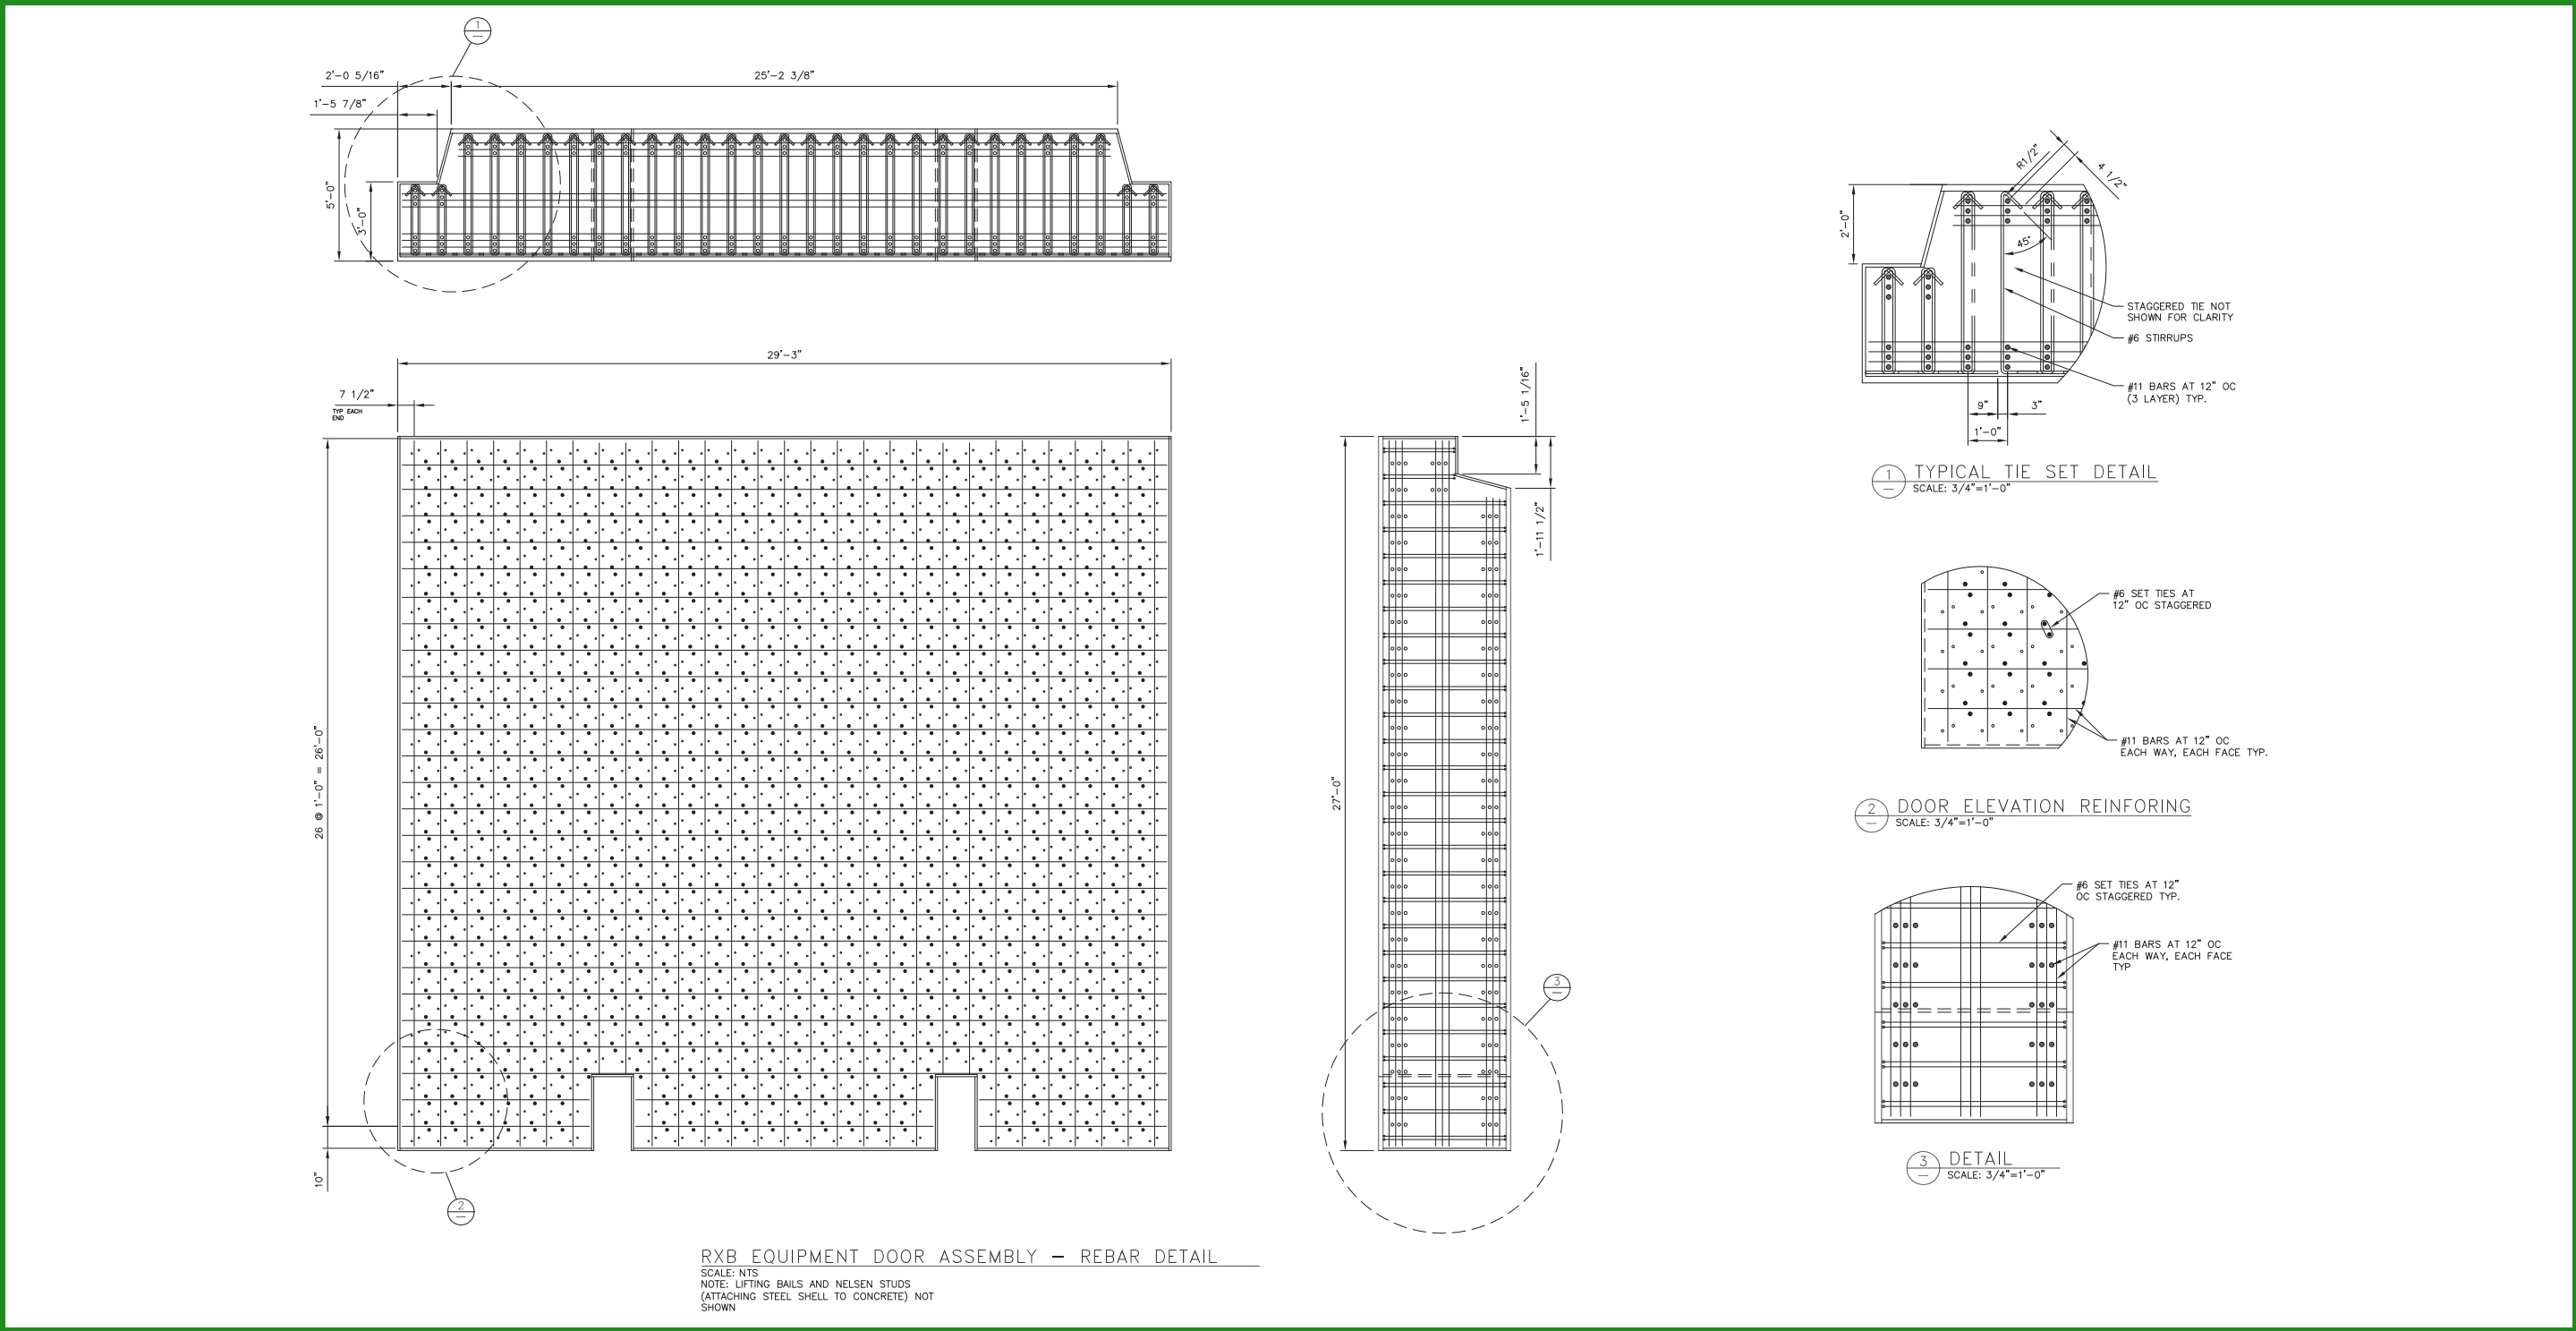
Reactor Building Equipment Door Weldment
